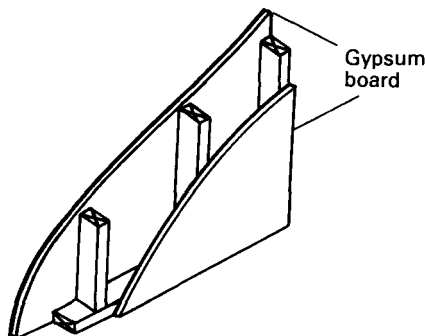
A single-stud wall with gypsum board on both sides has an STC rating of 32 to 36. Adding a second layer of gypsum board to each side increases STC rating of 44 to 47.
